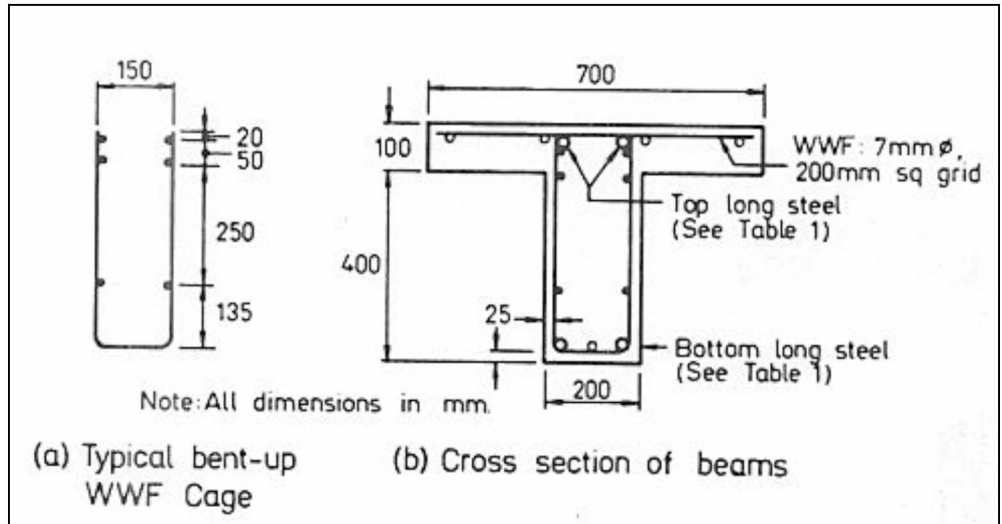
Welded Wire Stirrup with Longitudinal Rebar (Mansur, Lee, and Lee 1988)
